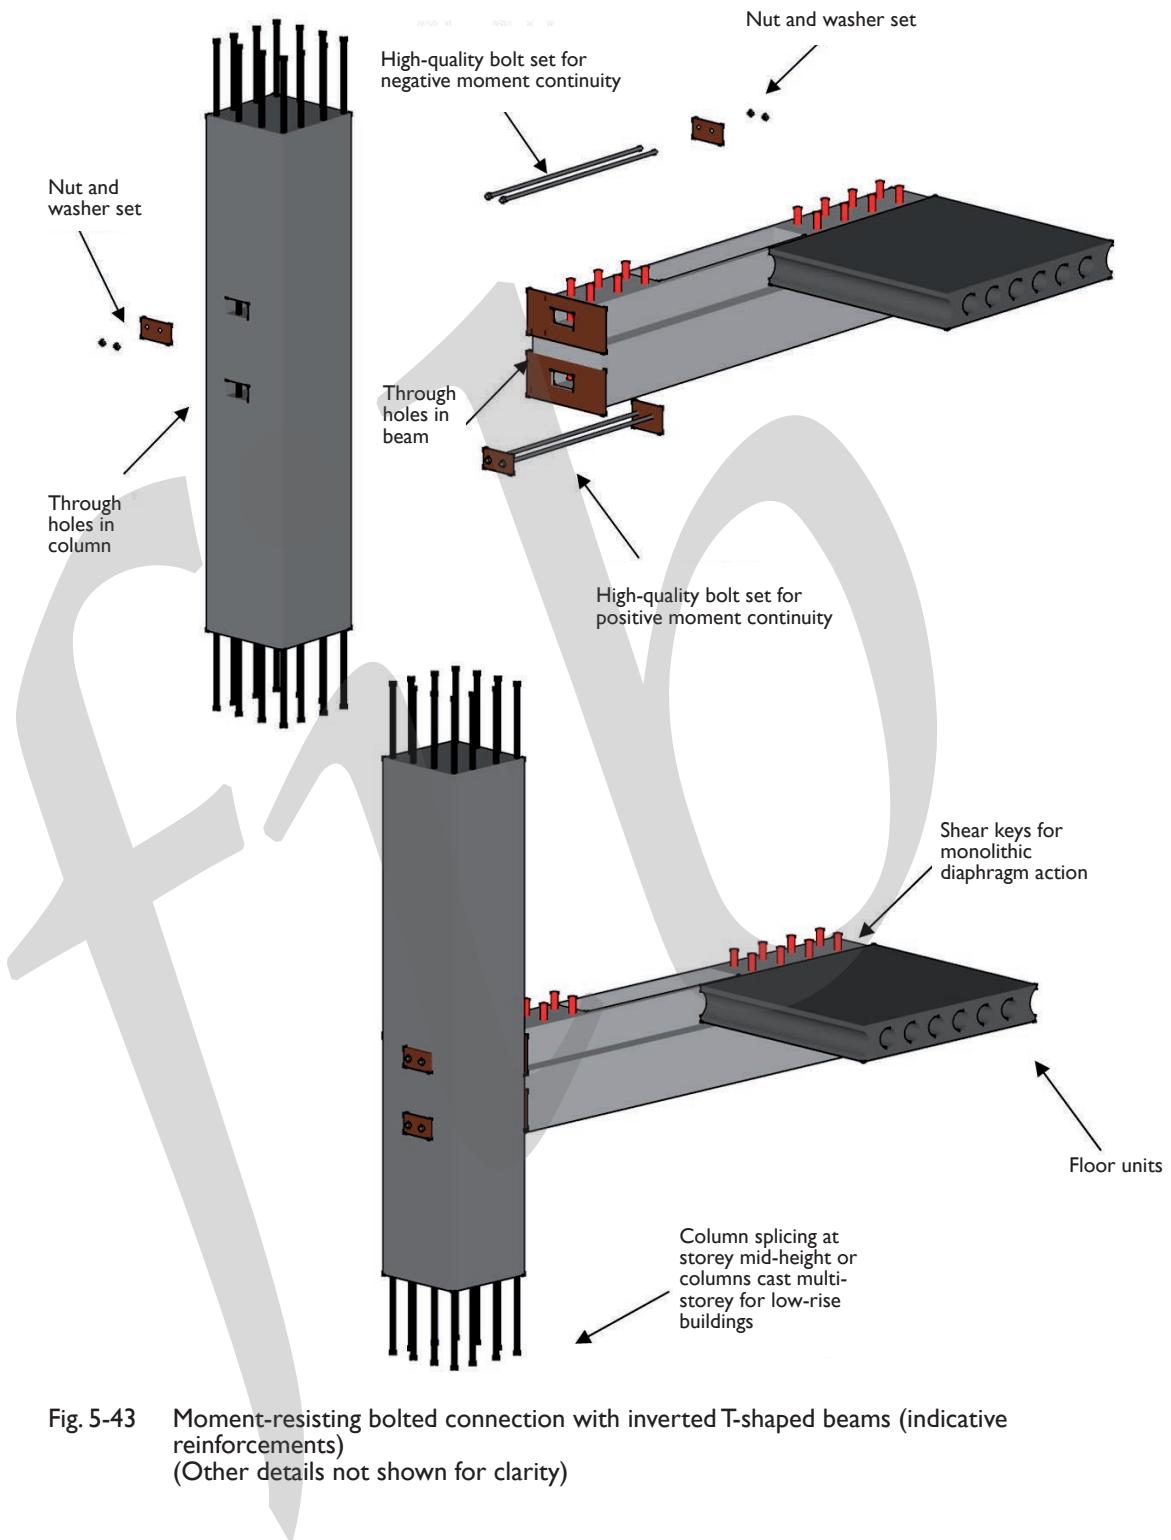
Moment-resisting bolted connection with inverted T-shaped beams (indicative reinforcements)
